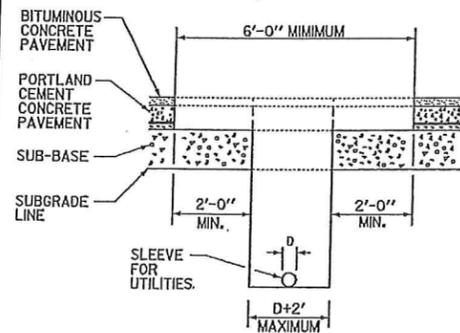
DETAIL "C" OPEN CUT EXCAVATION ACROSS BITUMINOUS CONCRETE PAVEMENT
